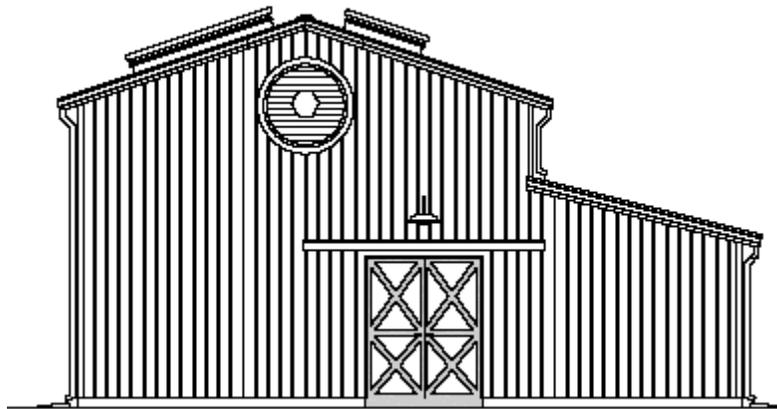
Elevation of Proposed Pumping Plant Structure
